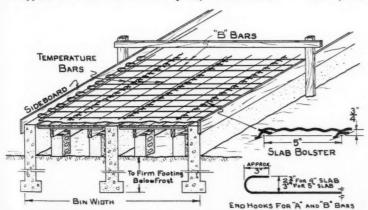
Arrangements of reinforcement in lower portion of suspended grain bin floor slab.
